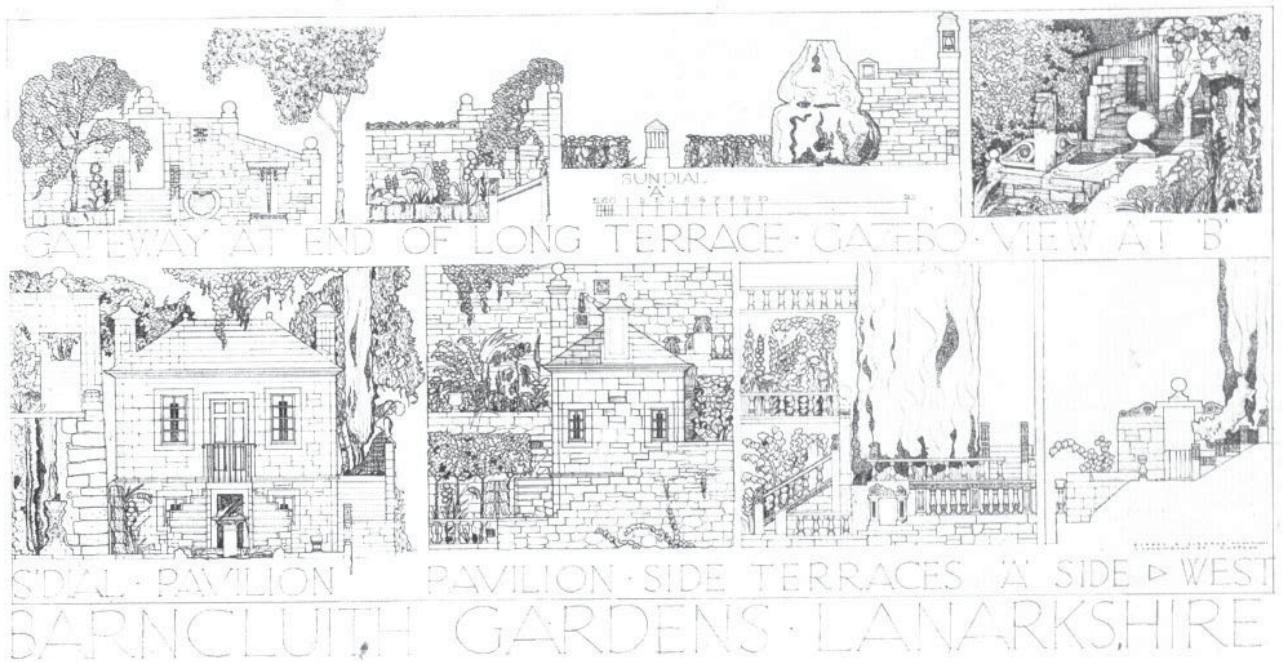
Barncluith: elevation details of structures. Surveyed and drawn by Sidney W Birnage, 1940s (copyright RCAHMS)
